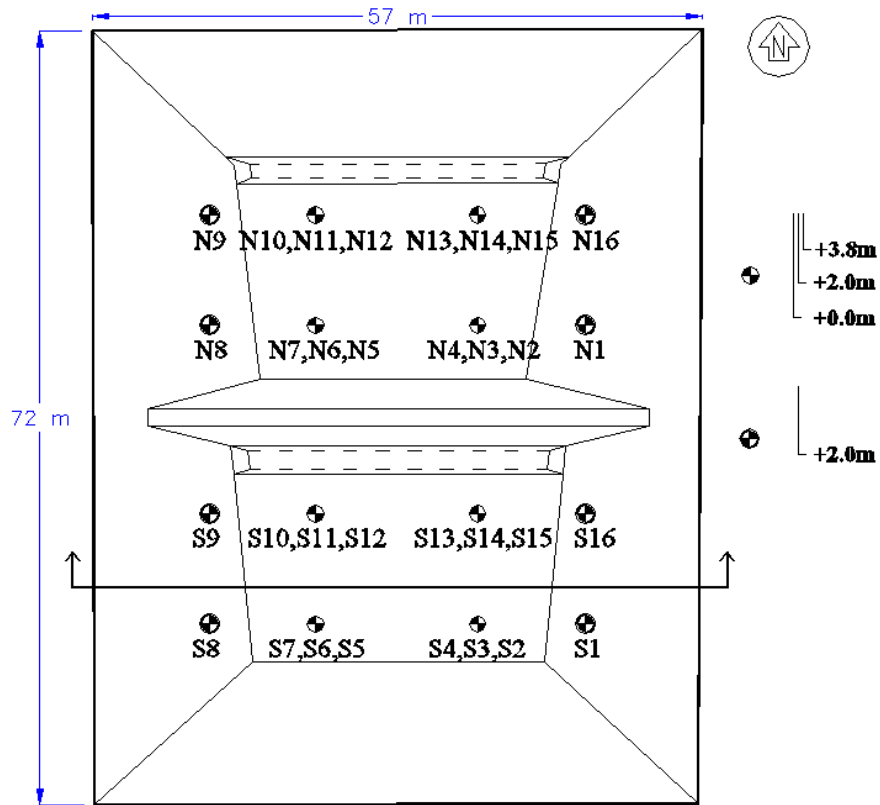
Plan of Tehran Pilot Scale Landfill Illustrating the Position of Fixed Extensometers
